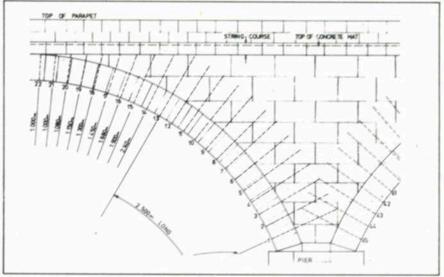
Arrangement of grout holes for Arch Soffits, Kincardine Viaduct
